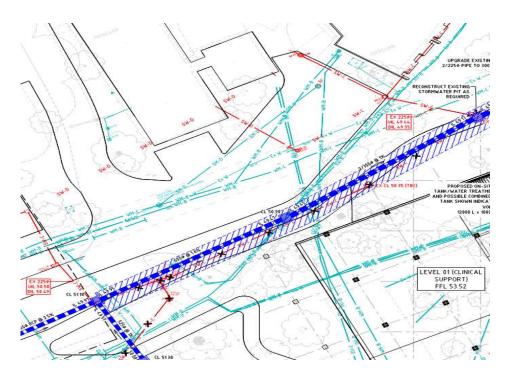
H: Proposed 600mm stormwater pipe to replace the existing 375mm pipe from the eastern end of Barber Avenue
